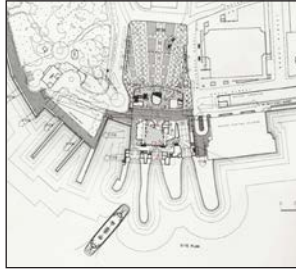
Whitehall Ferry Terminal 1992 scheme. Site Plan.
